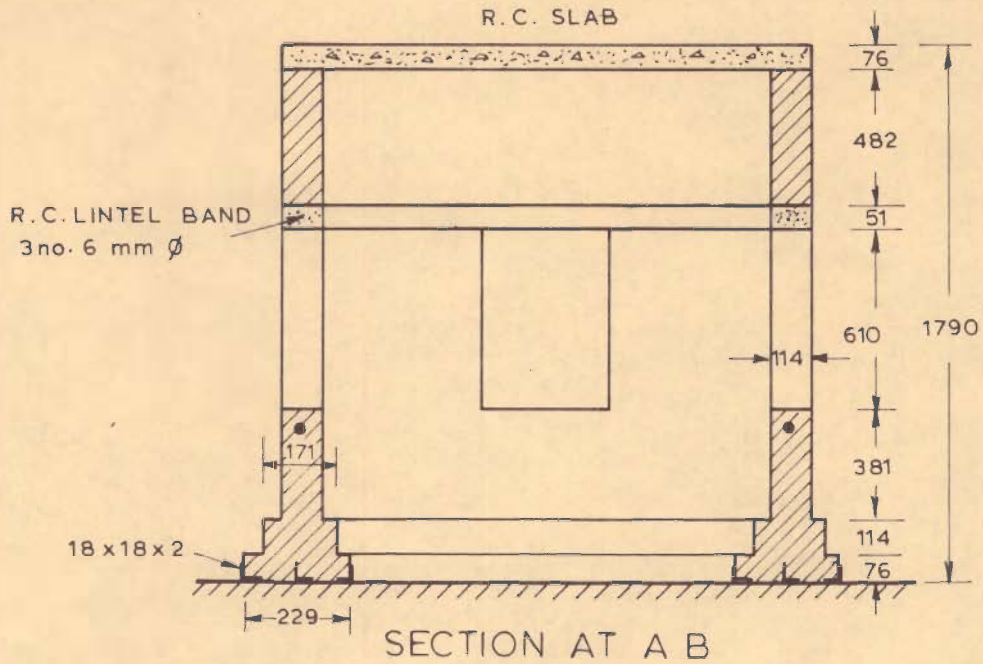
LAYOUT PLAN OF BRICK BUILDING MODELS CONSTRUCTED ON RAILWAY WAGON SHAKE TABLE
